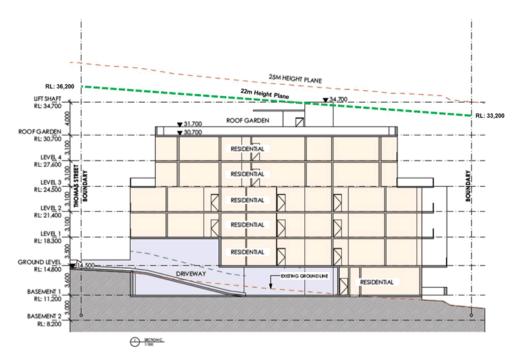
Section facing east from adjacent townhouse development (Source: PTI Architecture)
